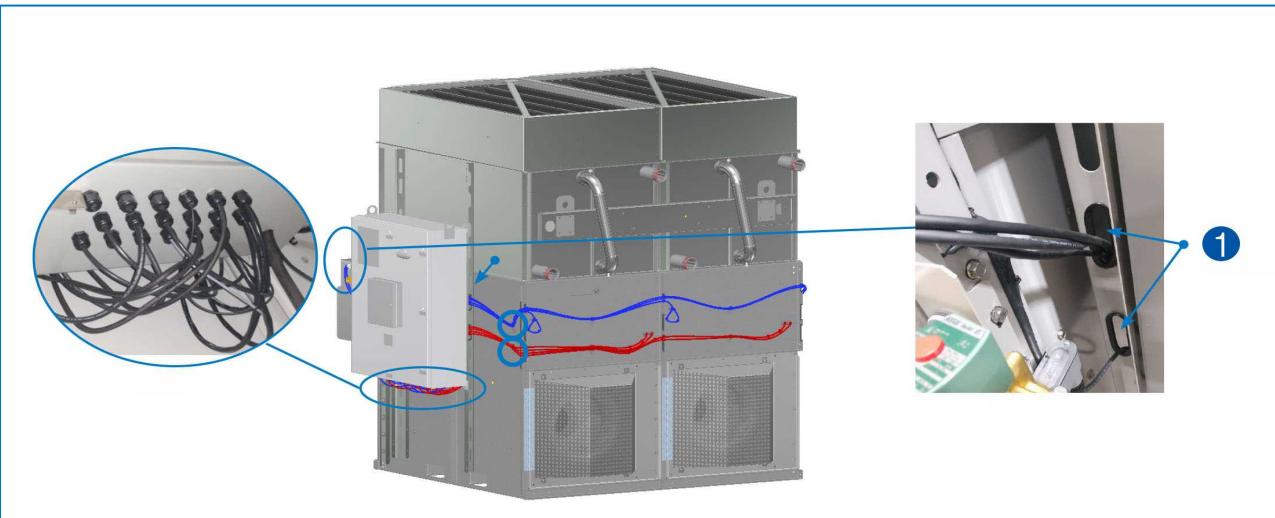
Wire to the iPilot™ Control System panel - 1. Mounting channel with oblong holes with edge trim.
